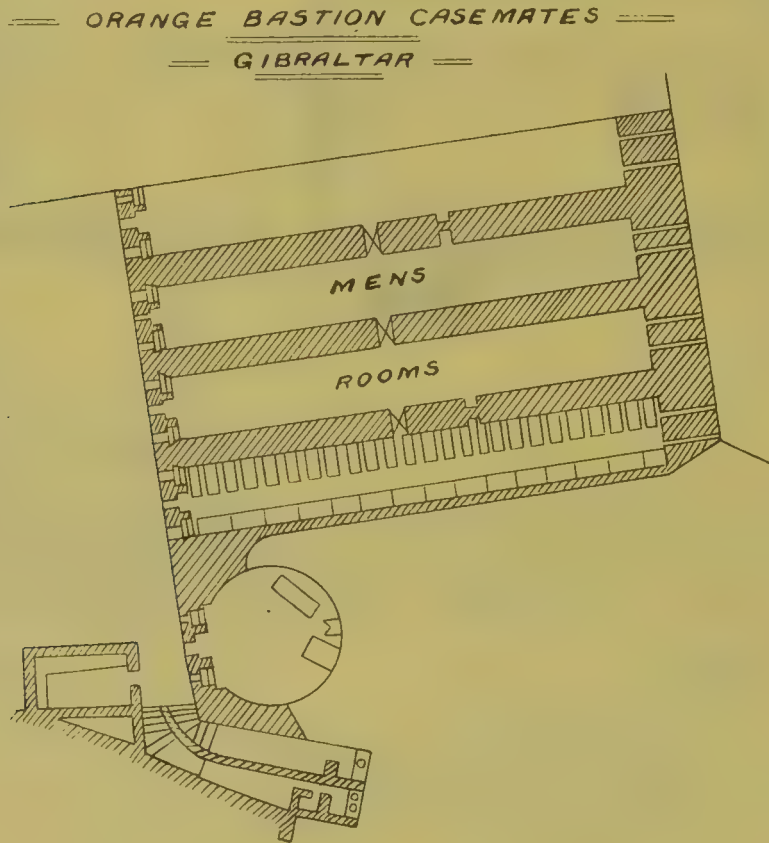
BLOCK PLAN OF CASEMATE BARRACK.
